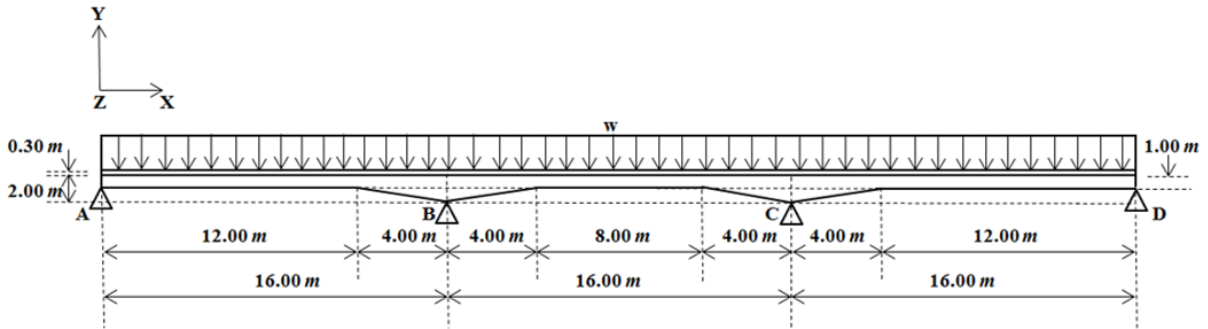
Non-prismatic reinforced concrete T-shaped beam
